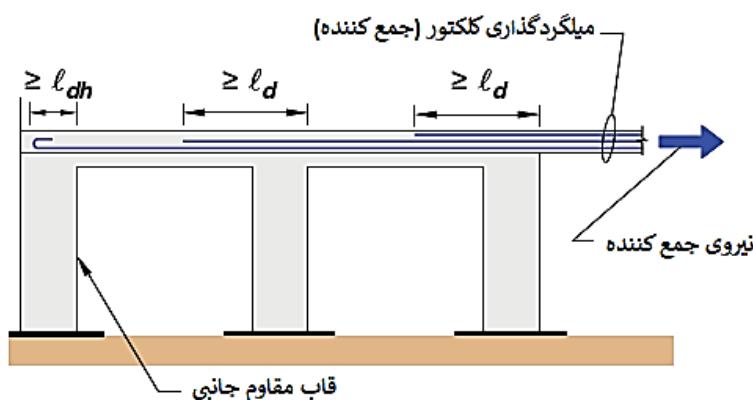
Schematic force transfer from collector into vertical element of the lateral-force-resisting system.
